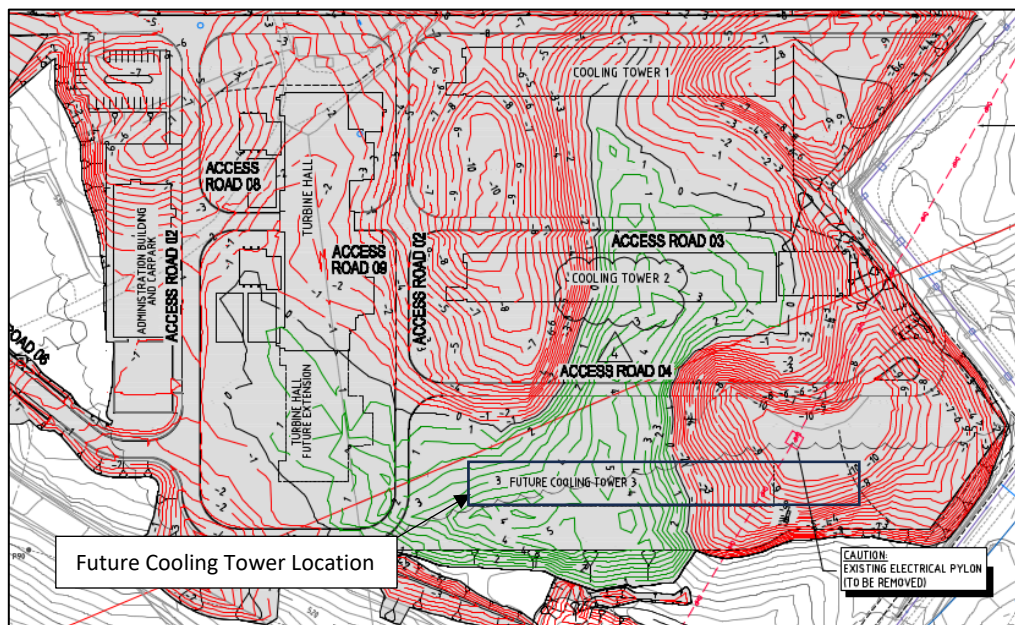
Te Mihi Geothermal Power Project - Cut and Fill Contour Plan (McConnell et al. 2011)
